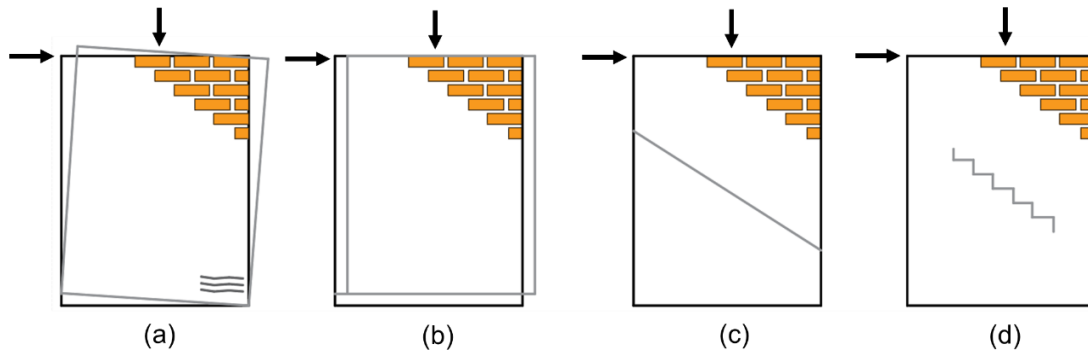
In-plane behaviour modes for laterally loaded URM piers: (a) rocking/toe crushing; (b) shear sliding; (c) diagonal cracking through the bricks; (d) stair stepped diagonal cracking (adapted from Marzahn, 1998).
